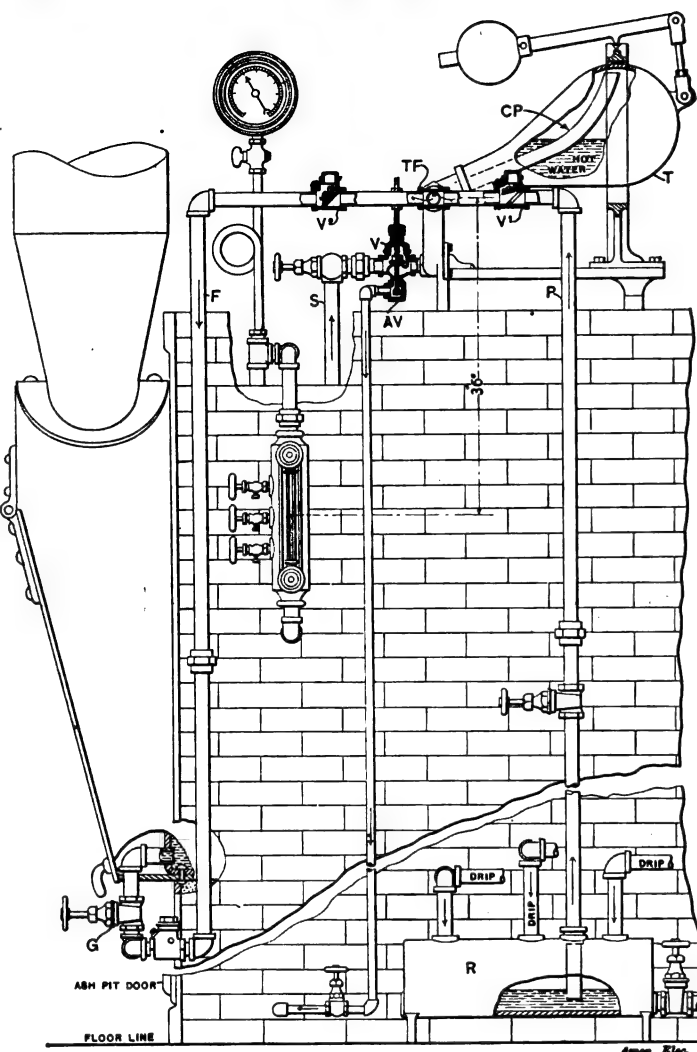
"BUNDY" STEAM TRAP CONNECTED.
